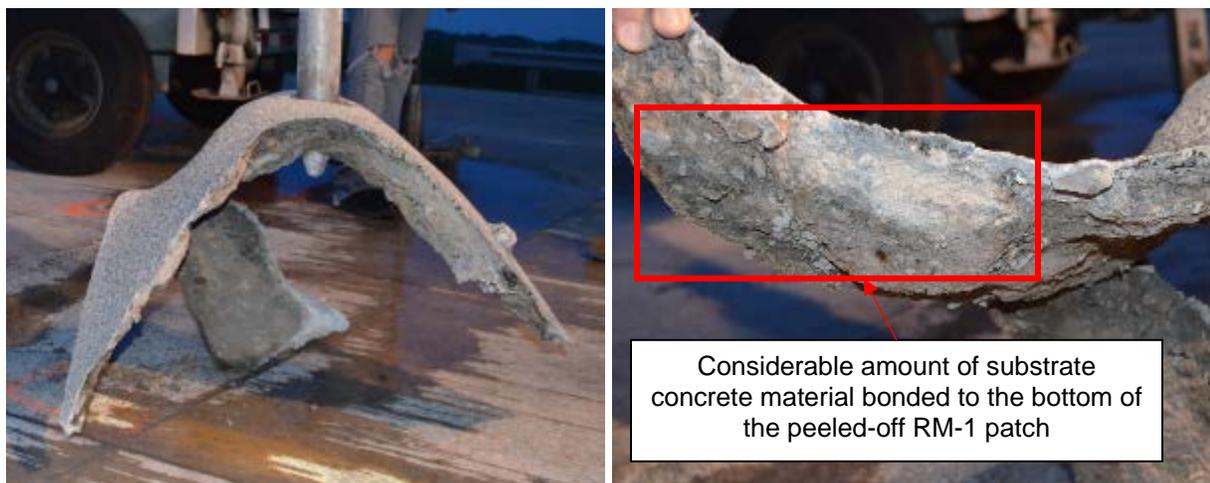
RM-1 PDRs peeling off from the concrete pavement.
